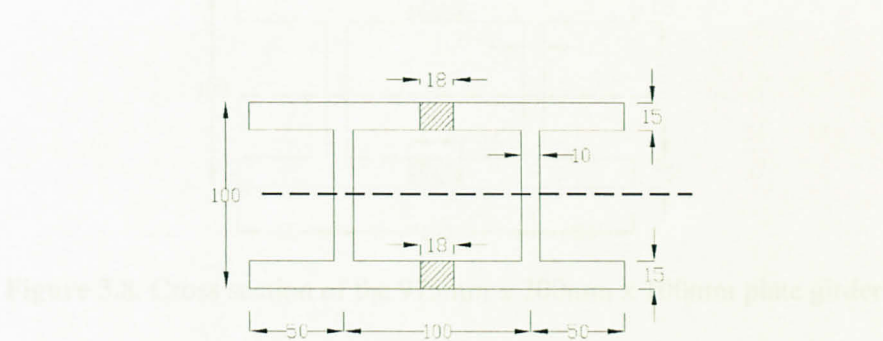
Cross-section of the 1255mm x 200mm x 100mm plate girder
